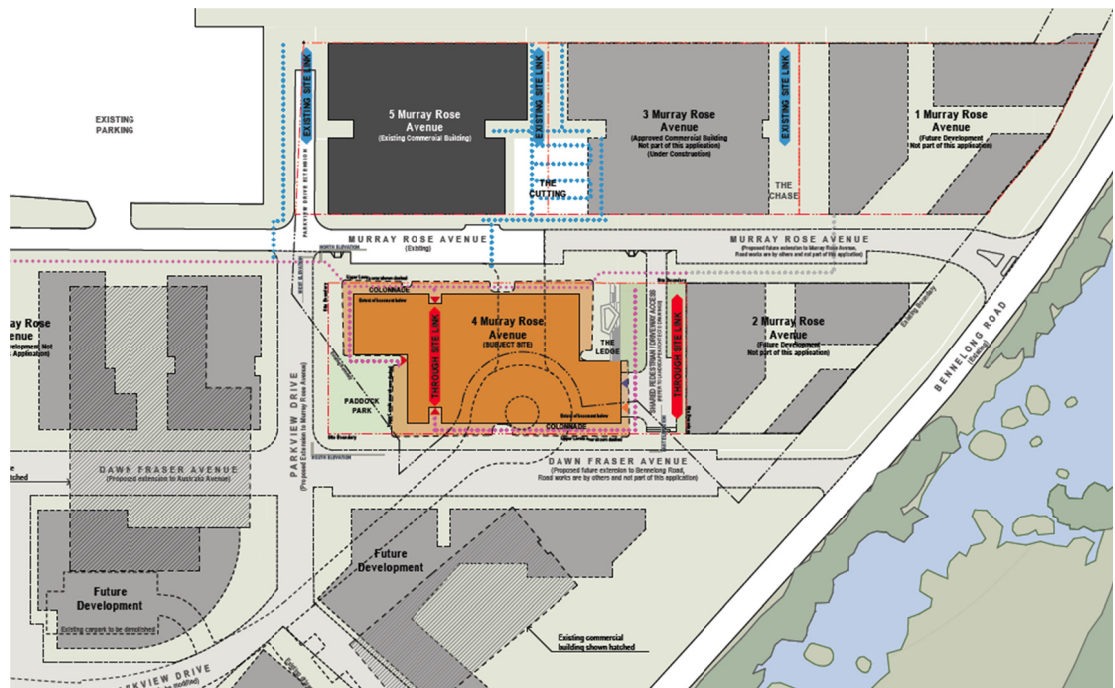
4 Murray Rose Avenue Master Plan – Future
